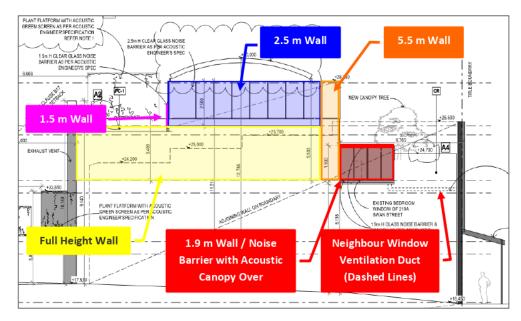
Heights of Walls / Noise Barrier – West Elevation (Image Source: YBL Remmus Architecture)
